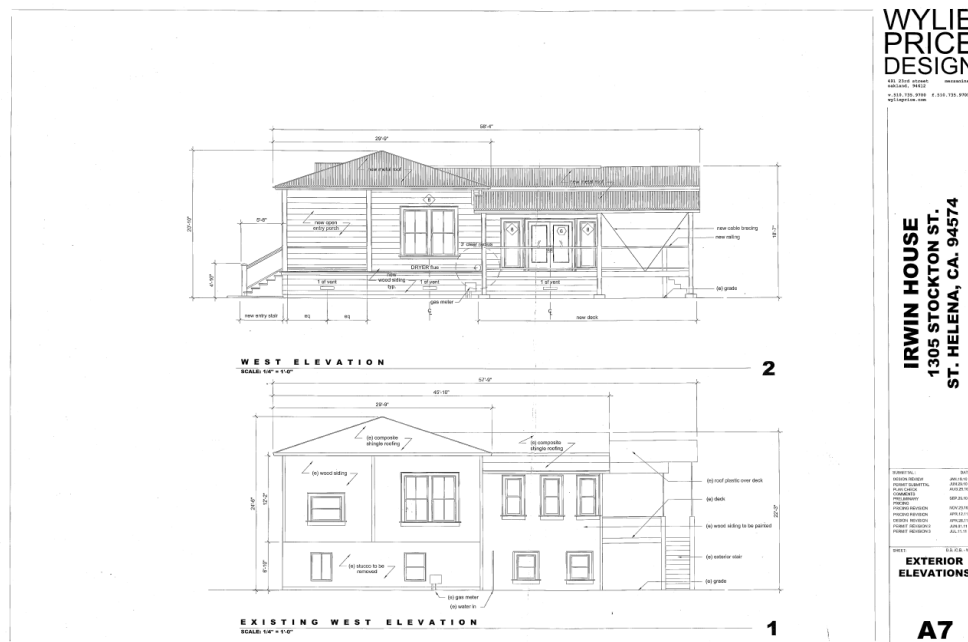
Architectural Drawings of the northwest elevation (Willie Price Design, 2011).
